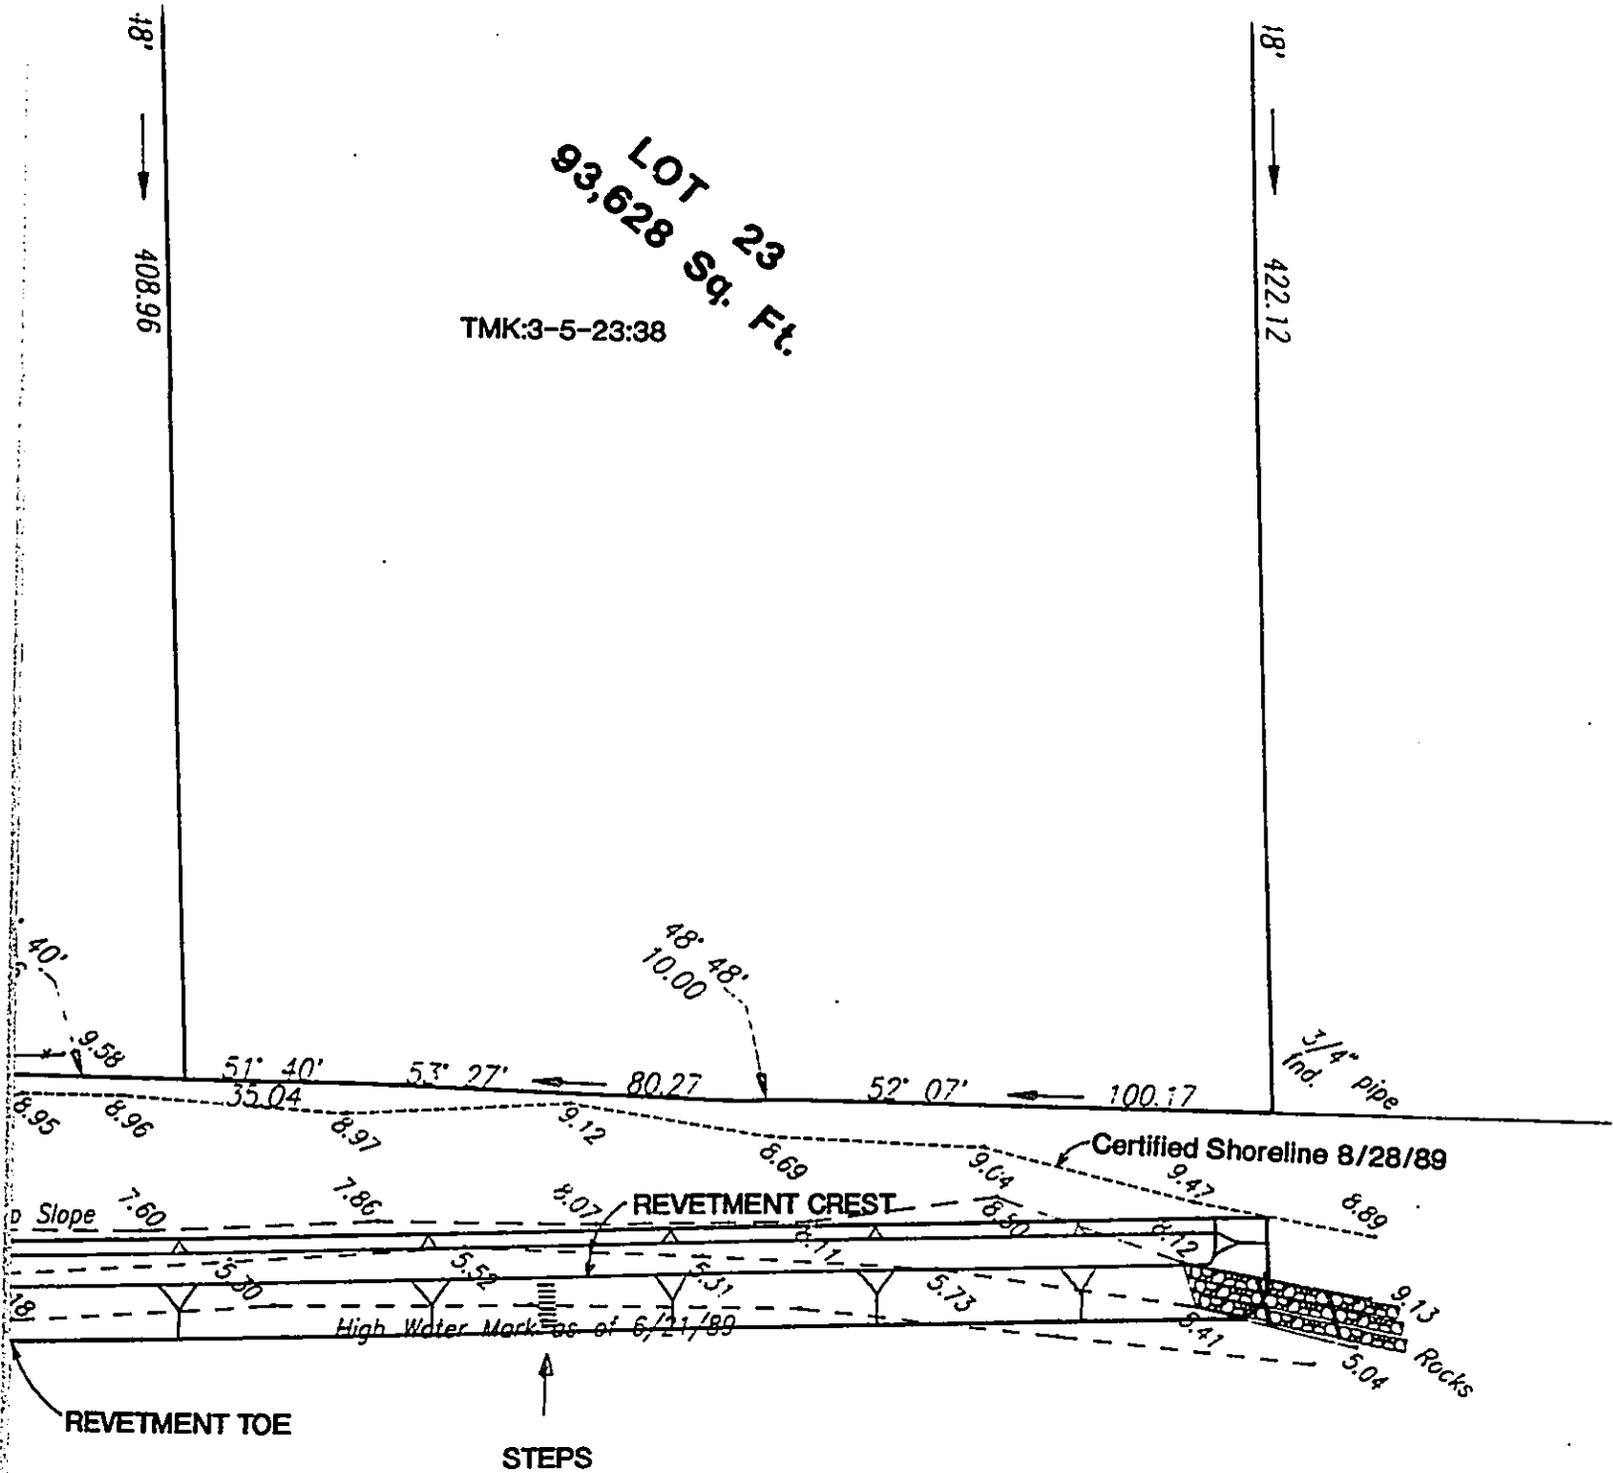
PROPOSED LAYOUT PLAN FOR REVETMENT
